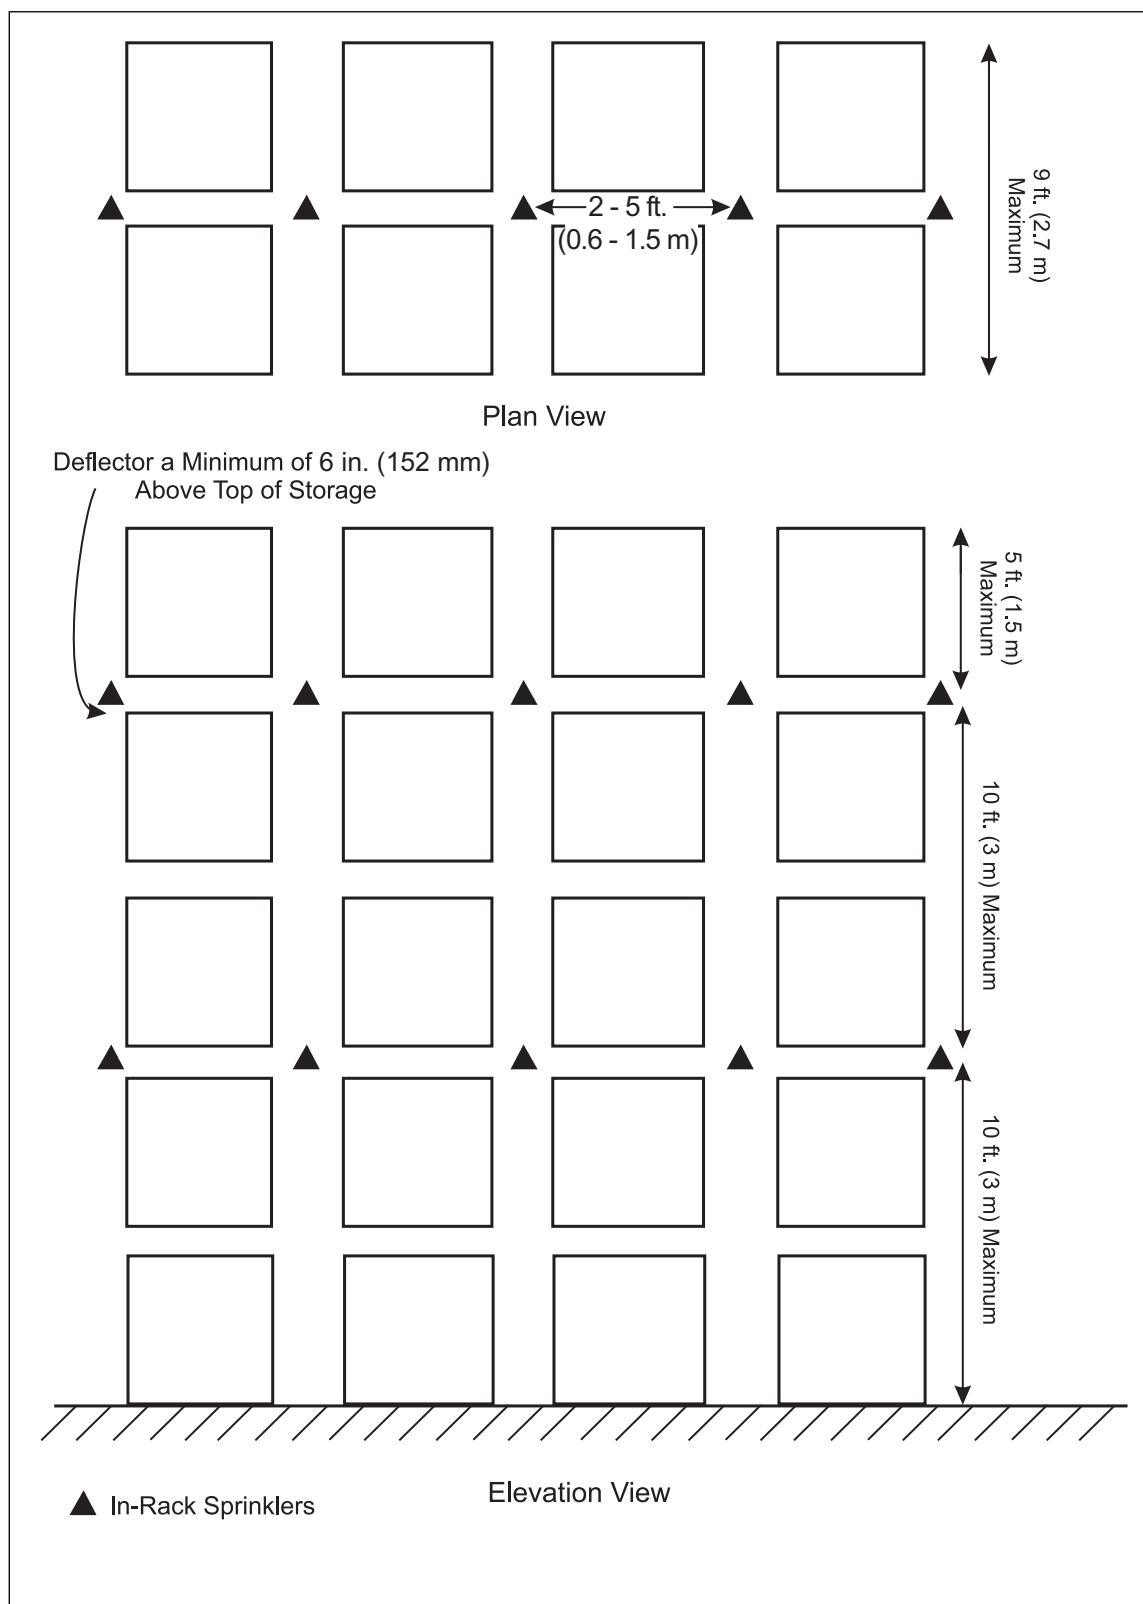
Double-row rack sprinkler layout: fire protection scheme C
